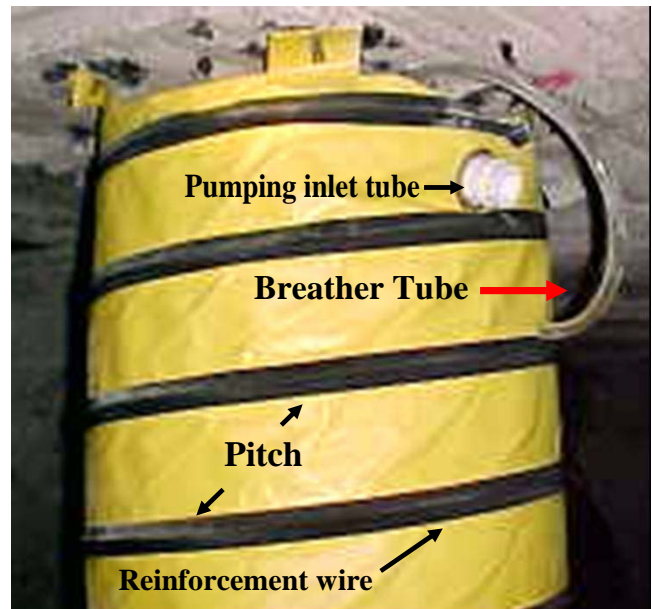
Bag construction showing inlet tube, breather tube, wire pitch, and reinforcement wire.
